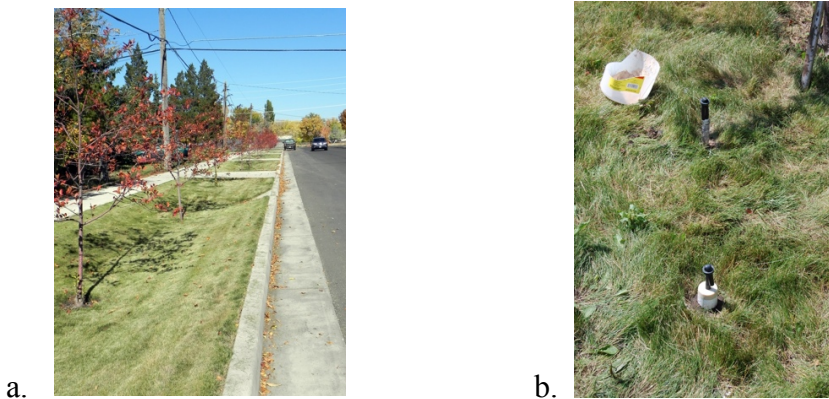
Curb cut and bioswale GI stormwater treatment system, 300 N Site, Logan, UT. a. Site view along roadway. b. Top of suction cup lysimeters used for pore water sampling.
